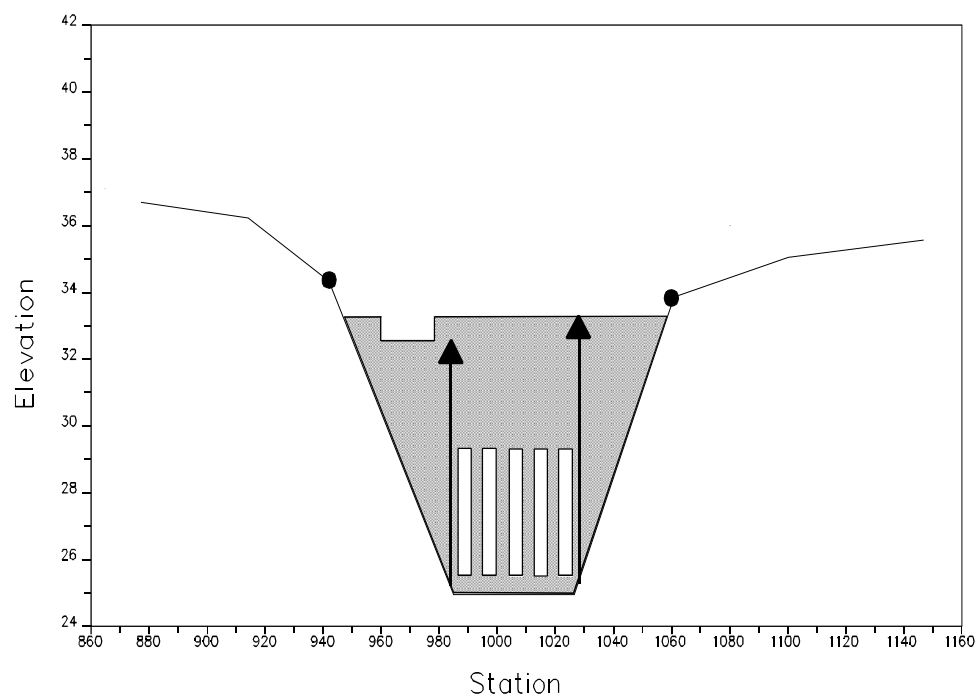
Cross Section 3 of Inline Gated Spillway and Weir
